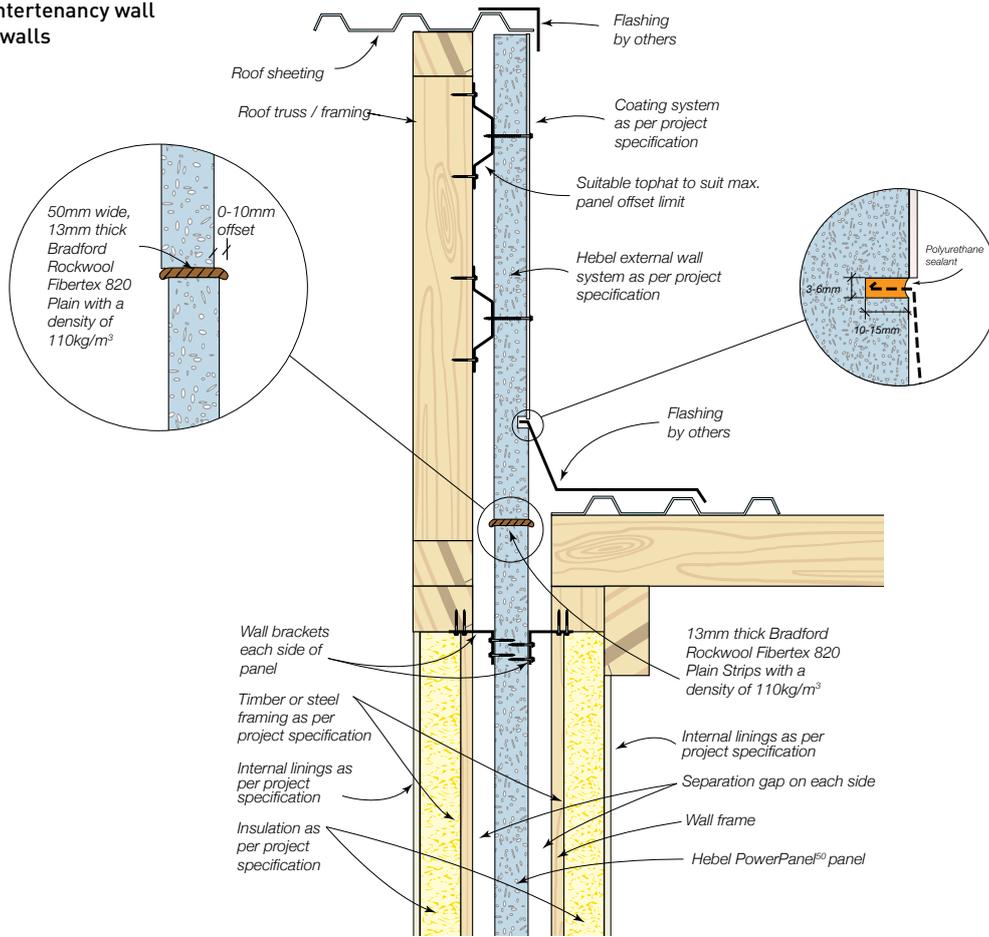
Intertency wall to lightweight clad external walls
